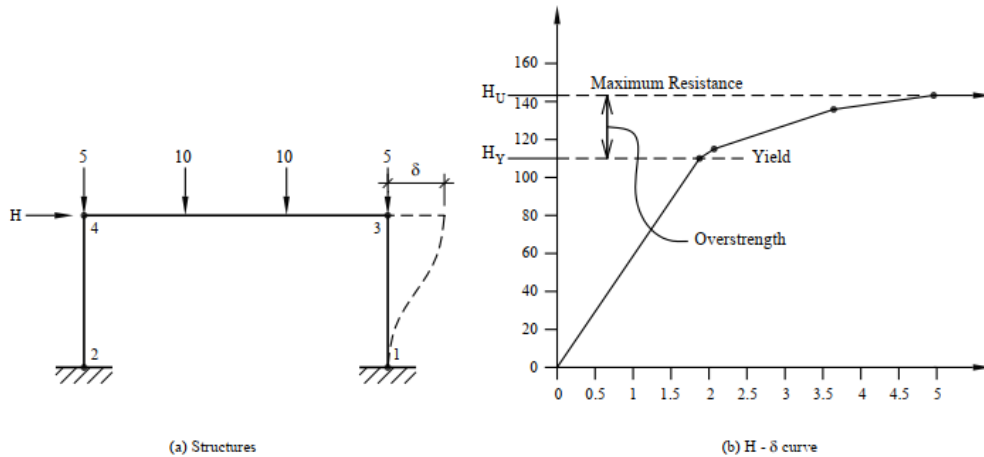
Initial Yield Load and Failure for a Ductile Portal Frame
